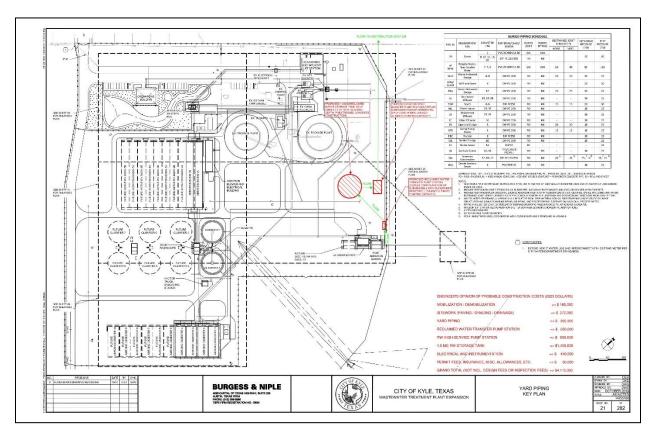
Proposed GST and Pump Stations at Existing WWTP
